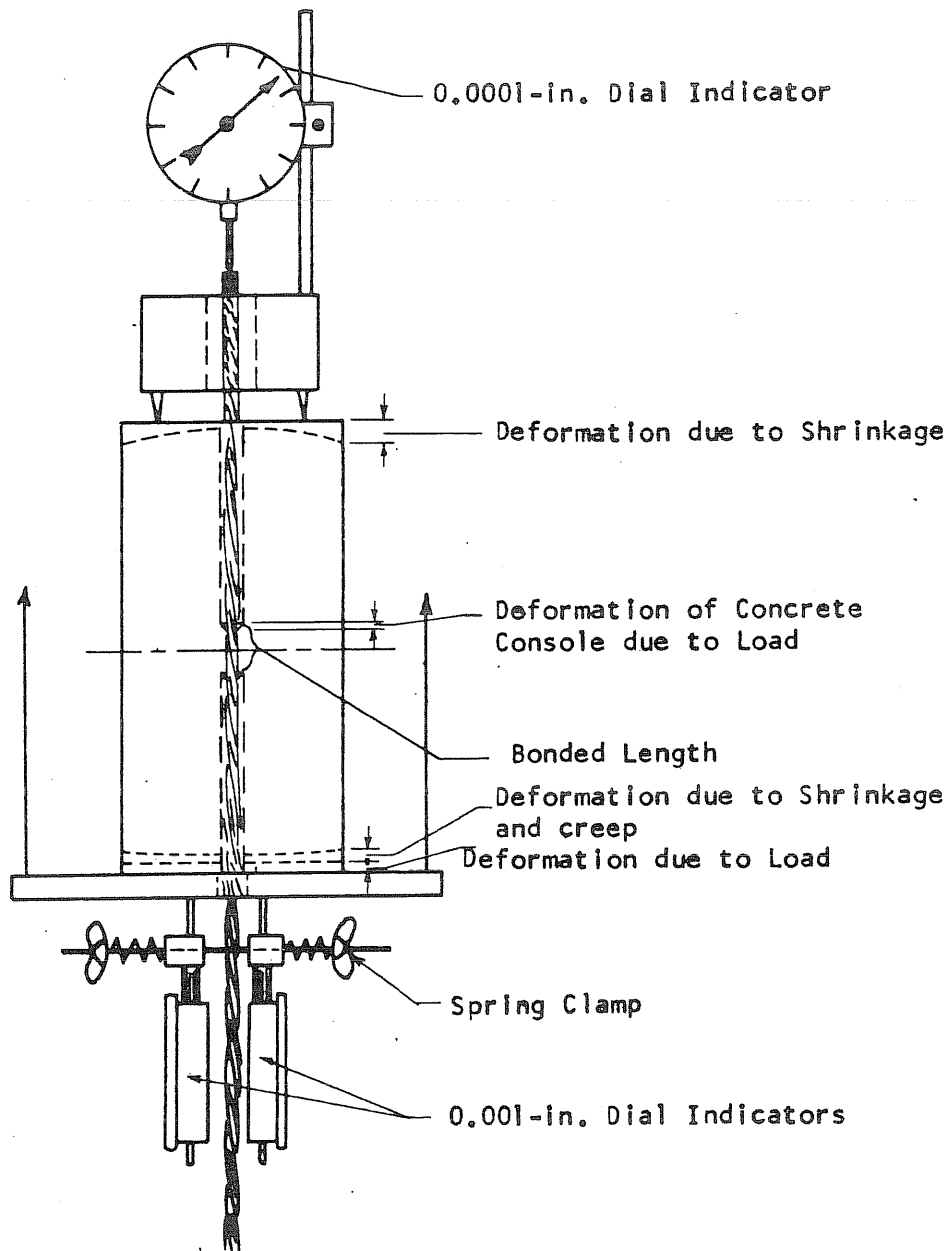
TEST SETUP FOR SPECIMENS WITH BONDED LENGTHS EXCEEDING TWO in.
